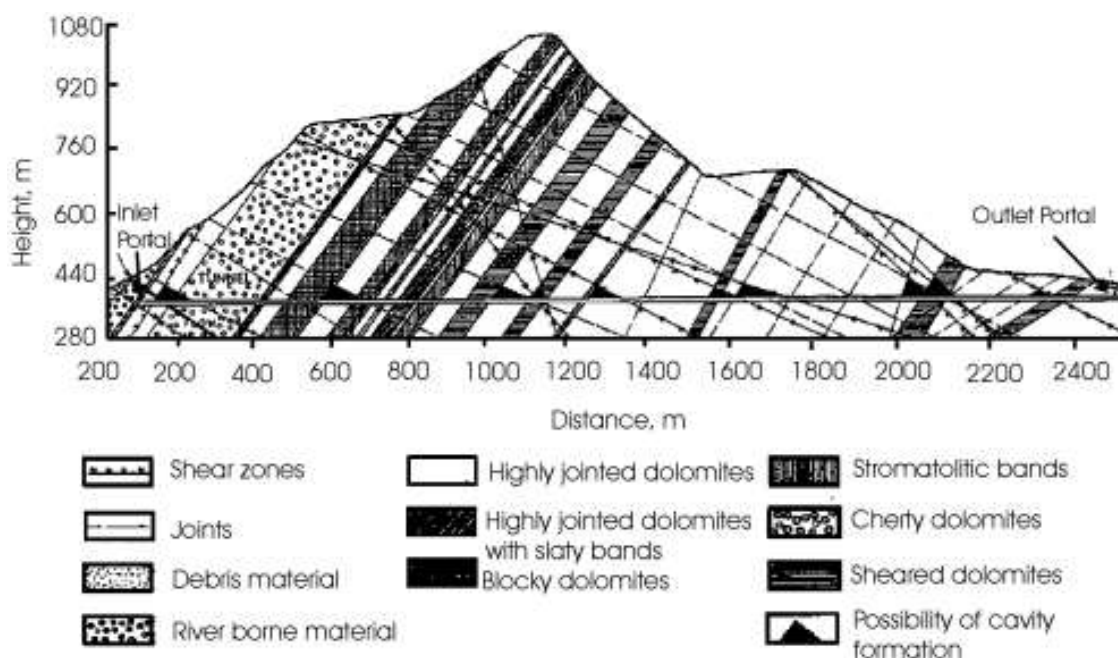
Geological cross-section along Salal hydro power project tunnel (Jethwa, 1981)
